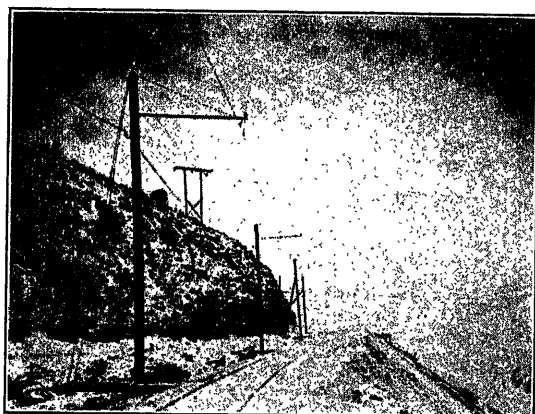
TROLLEY CONSTRUCTION ON WASTE FILLS
